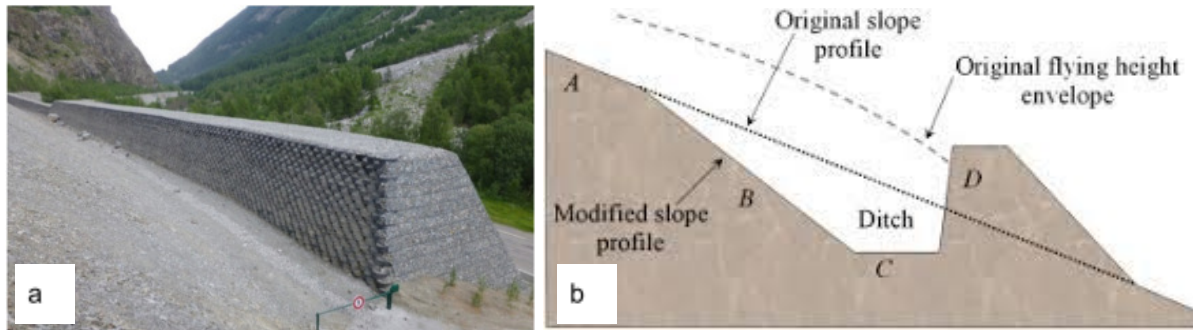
Passive protective structures at the base of a bedrock. (a) Embankment made of gabions (b) ditch caved and embankment raised with material of the ditch.
